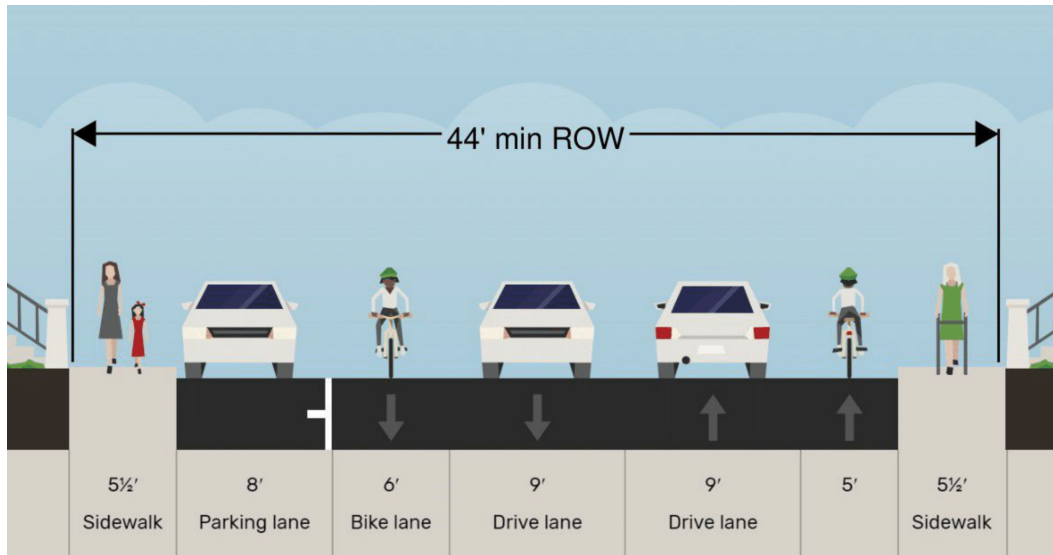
Front Ave Proposed Cross Section – Option 2
